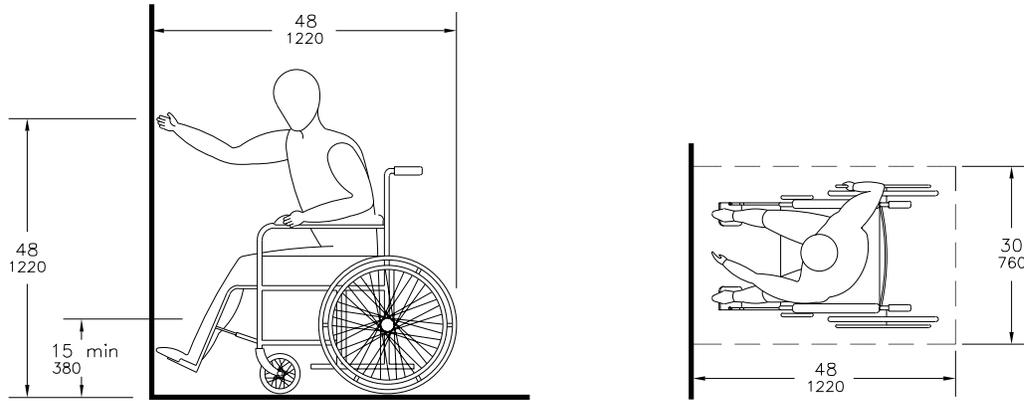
cont'd. Minimum Clear Floor Space for Wheelchairs
